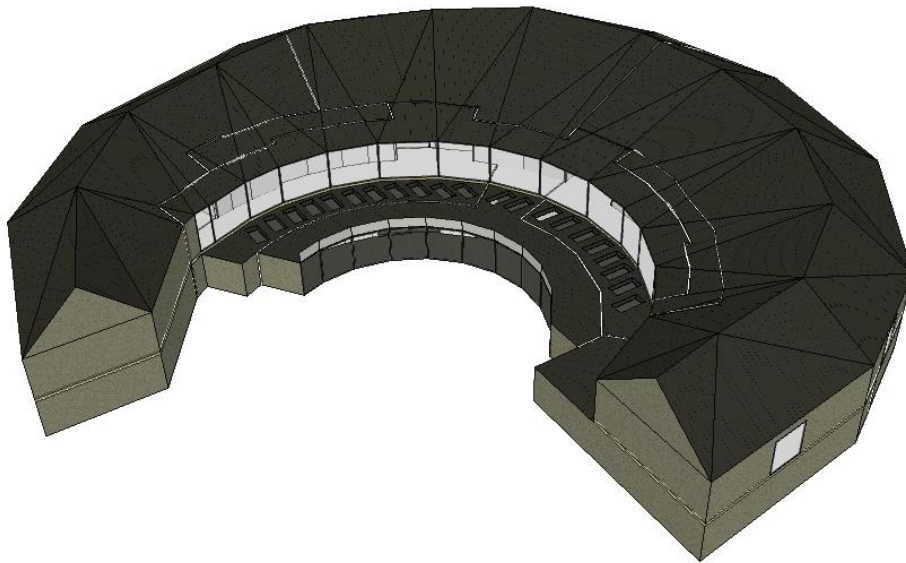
Illustration of the building with skylights and railing towards inner perimeter
